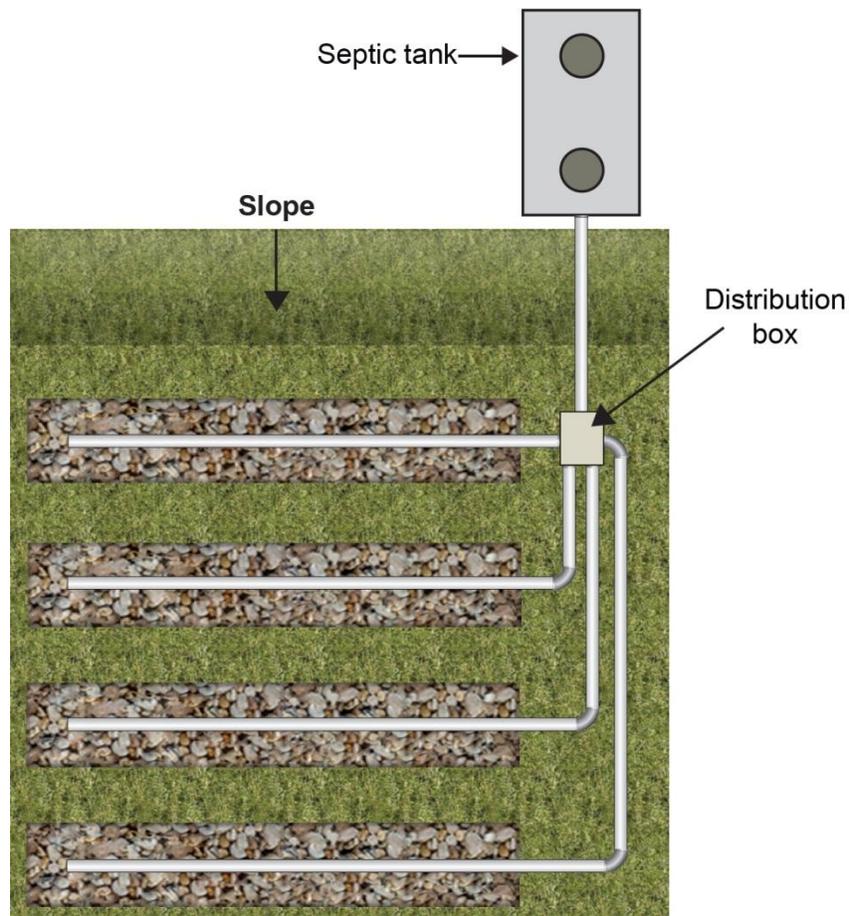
Overhead view of a distribution box layout on a sloped site.
